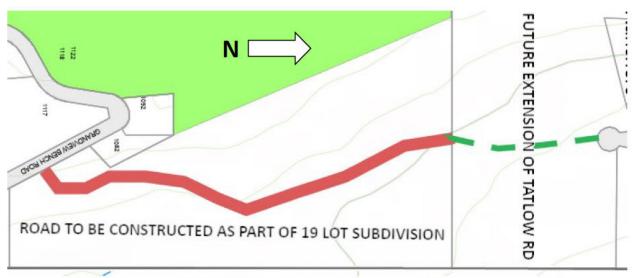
FUTURE NEW ROAD THROUGH SITE FOR 19 RR1 LOTS.
